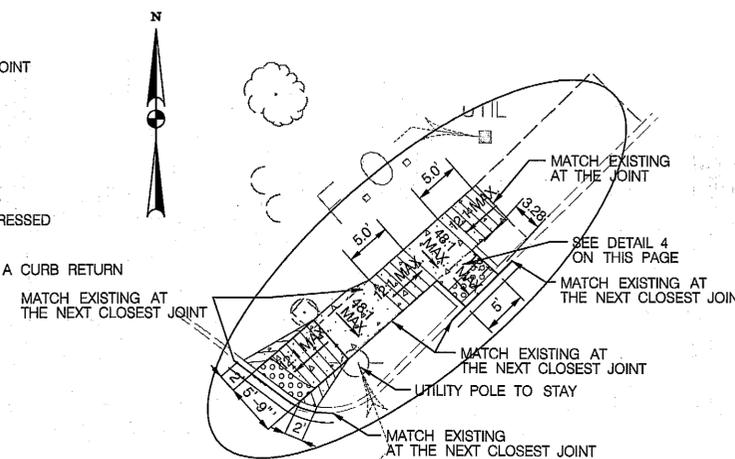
DETAIL A: NEW CURB AND GUTTER PLACEMENT (OPTION 1)
